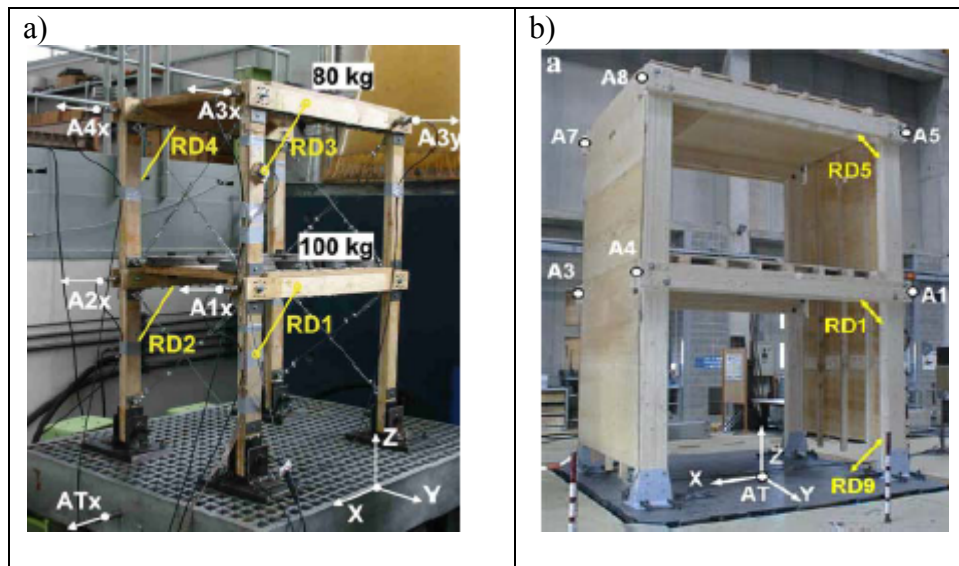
a) 1:4 scale model building b) Full-scale model building [Heiduschke et al., 2008]
